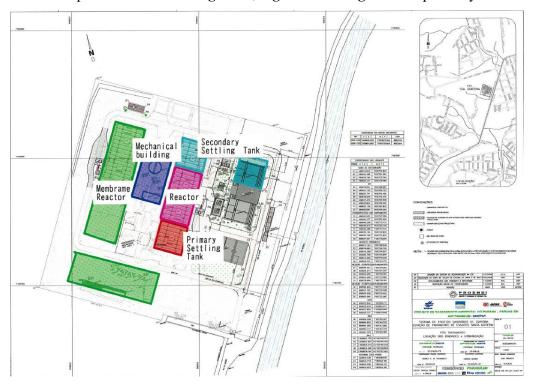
Layout planning in Santa Quiteria STP
